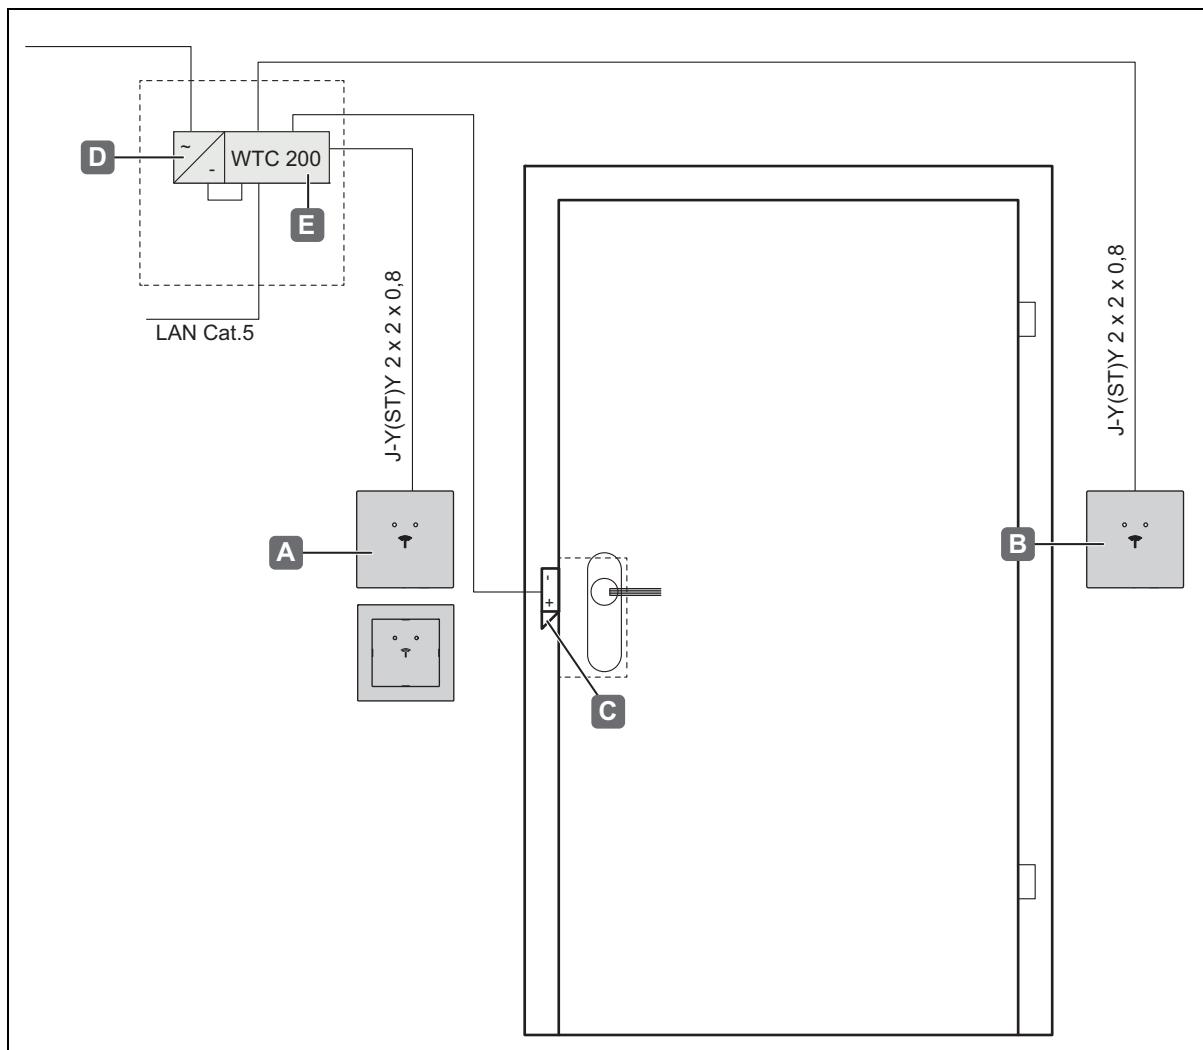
Installation example 3 - a door with two readers (e.g. inside and outside), electric strike and controller
